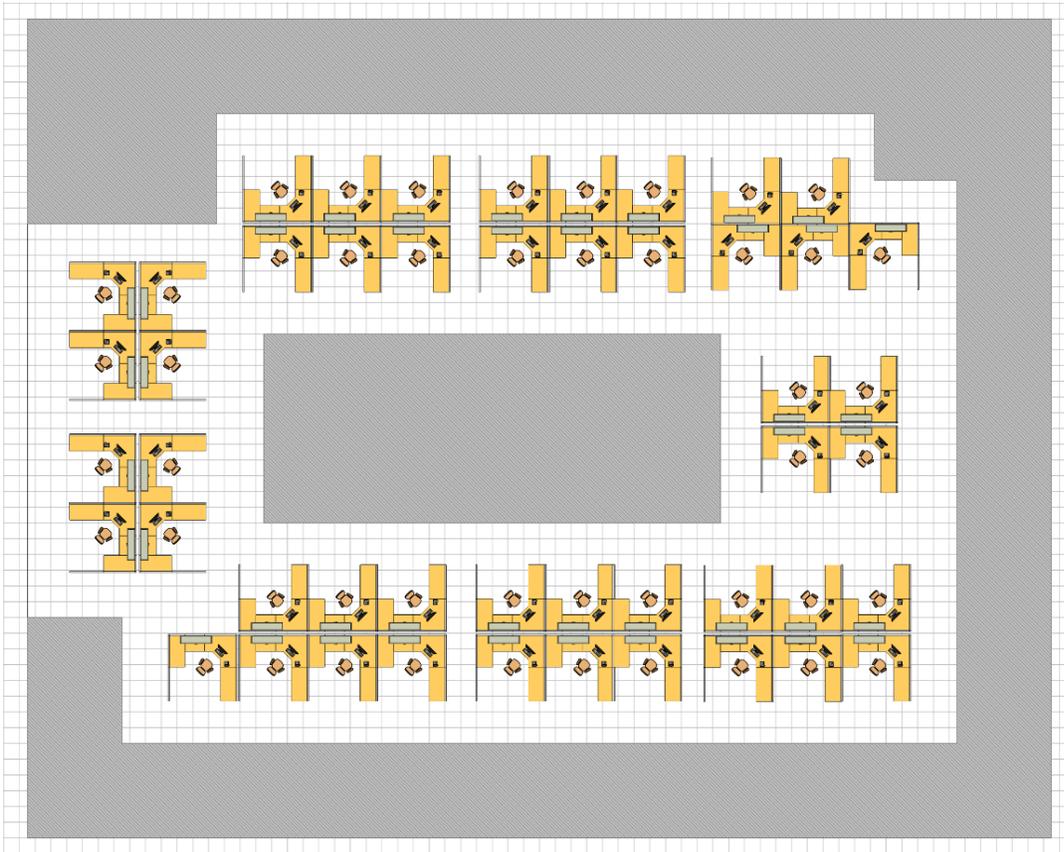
Floor plan of Model Office C for a large open-plan office area.
